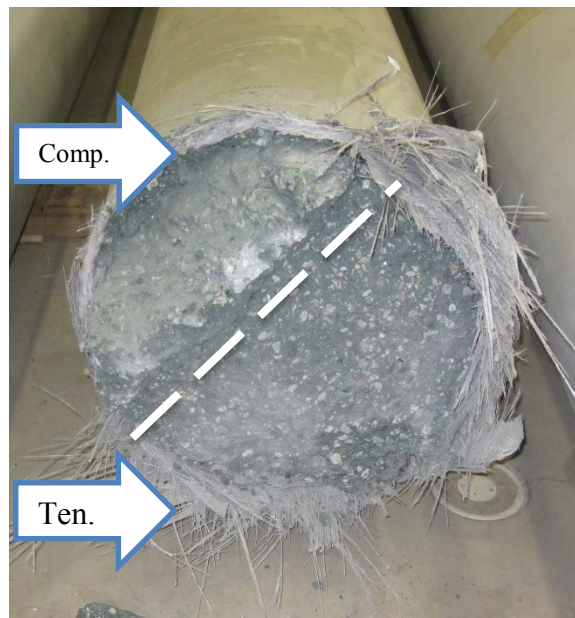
Tension and Compression Zone in Concrete-Filled Pile
